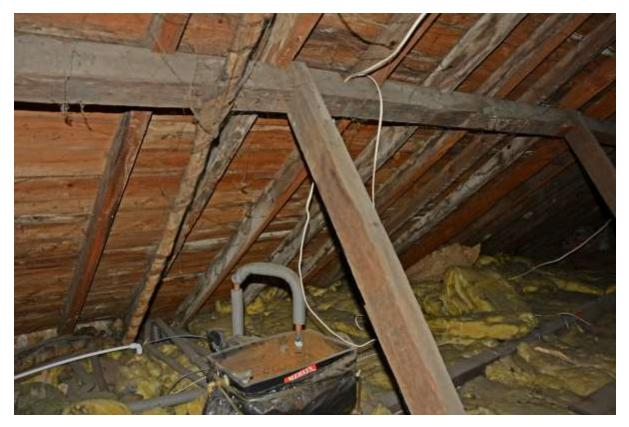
The northeast side of the roof space, detail of purlin and single supporting strut
